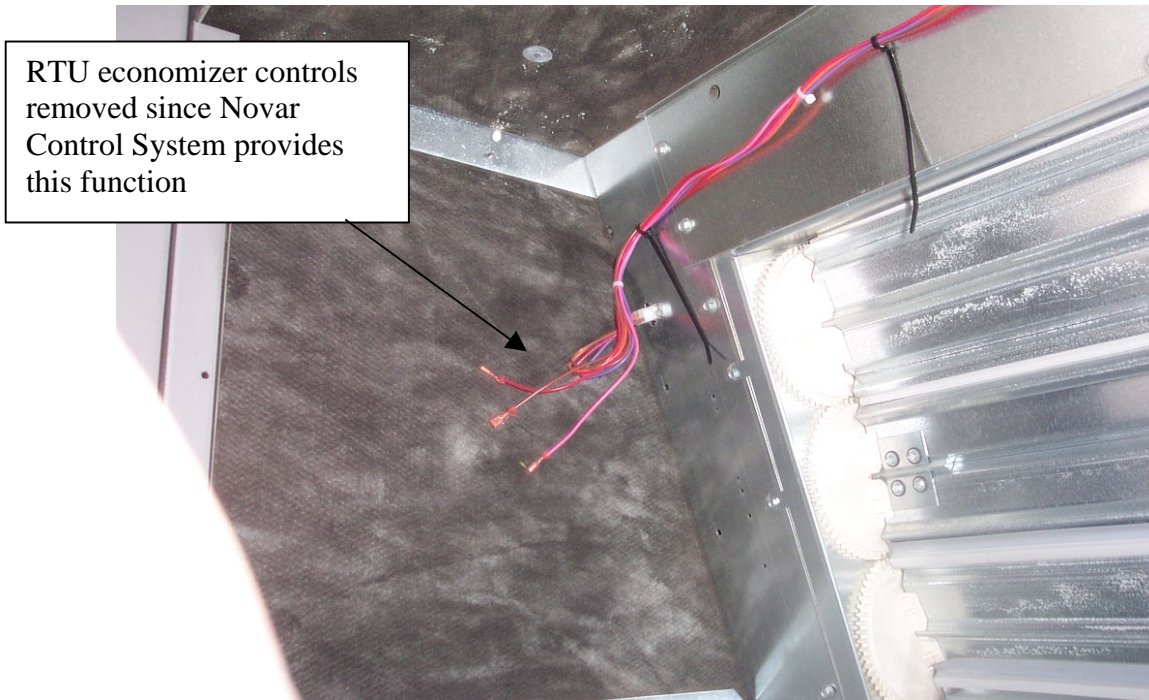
Fresh Air Damper Inside Fresh Air Intake Hood
